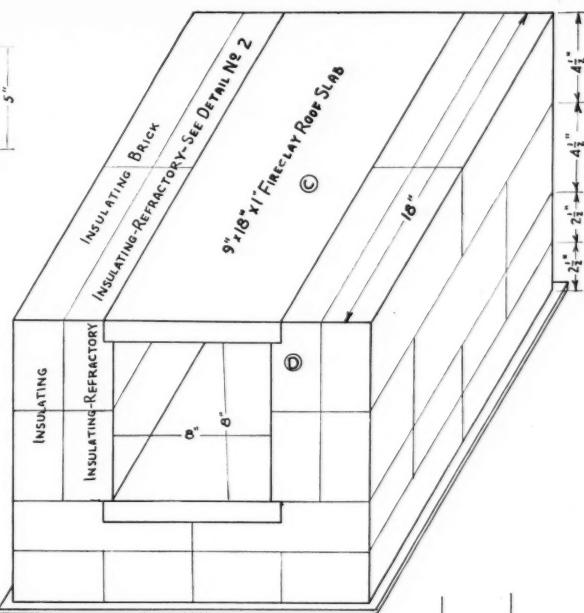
SIDE WALL AND ROOF SLAB ASSEMBLY
